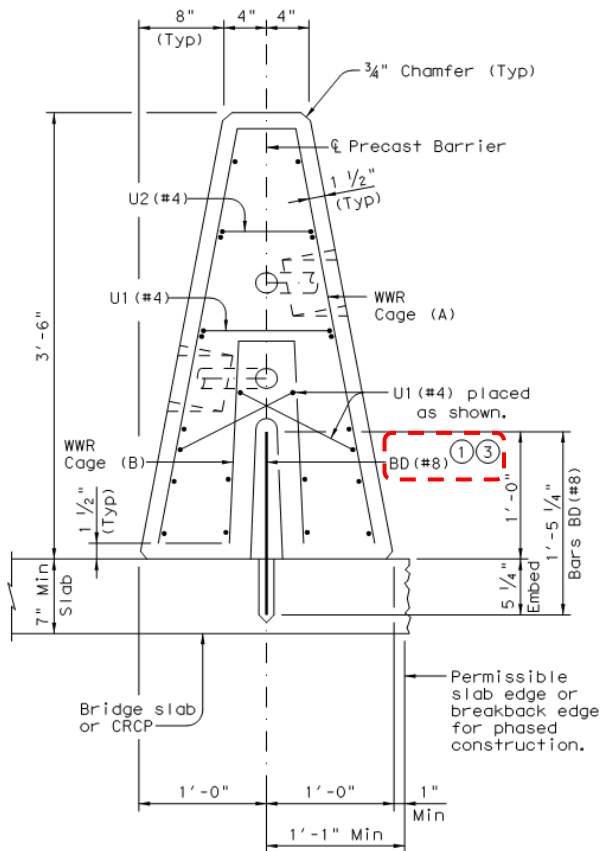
Example of temporary concrete barrier with adhesive anchors, approved for MASH TL-4 by TxDOT.
